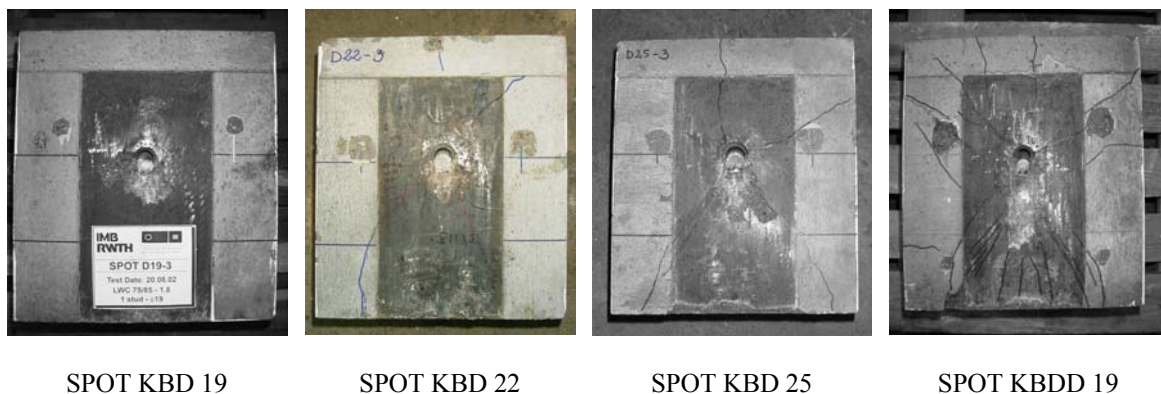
Concrete crack patterns (SPOT tests)
